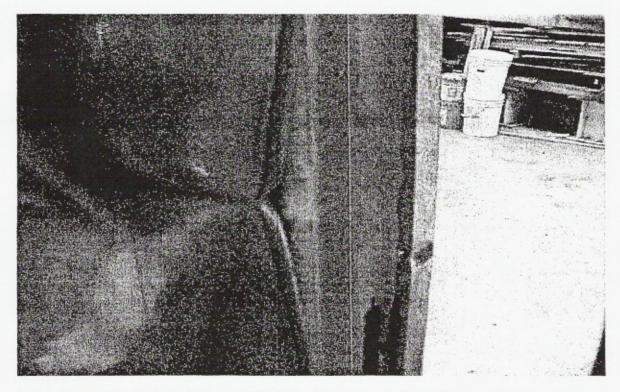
Closeup of Failure of 8' Galv.-Galv. Panel Under Compressive Loading
